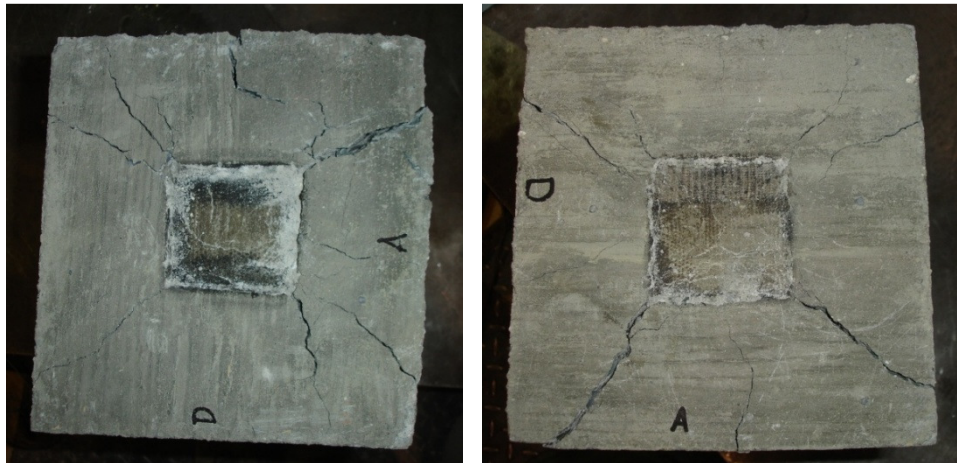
Top Surface after failure: 2.5 in. bearing pad
